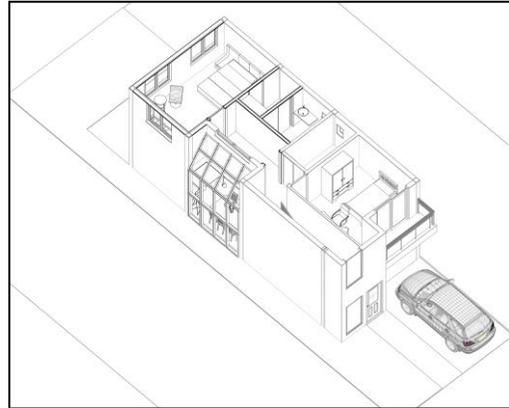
First floor 3D plan in stage two – bold lines show created elements
